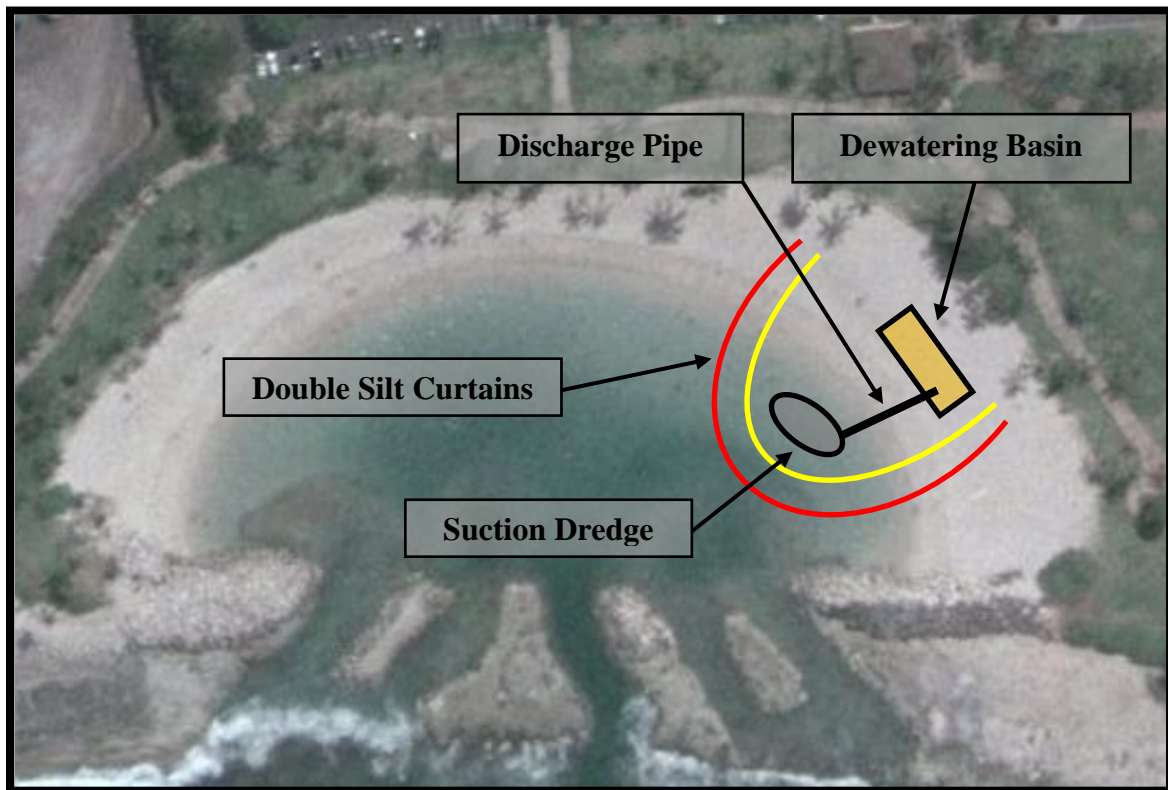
Typical suction dredge work area and silt curtain layout, plan view
